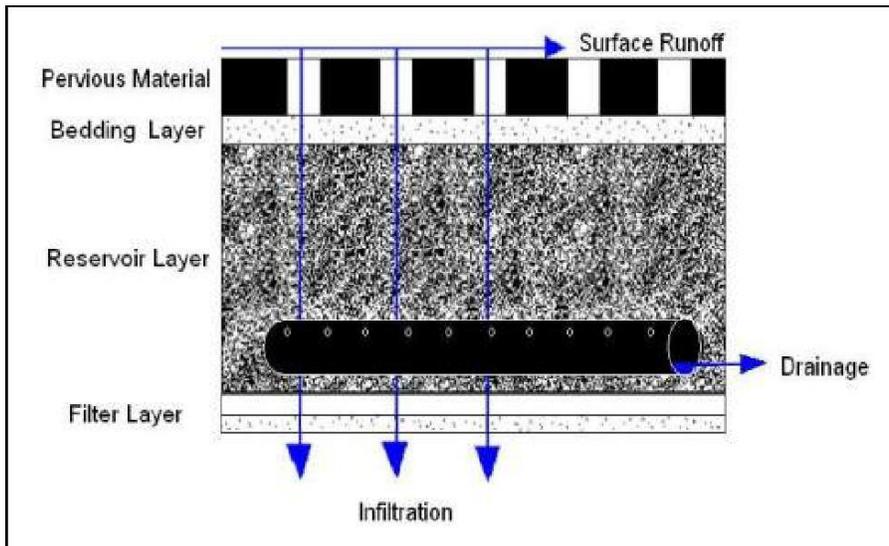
Cross Section of Typical Permeable Pavement (Source: Hunt & Collins, 2008)
